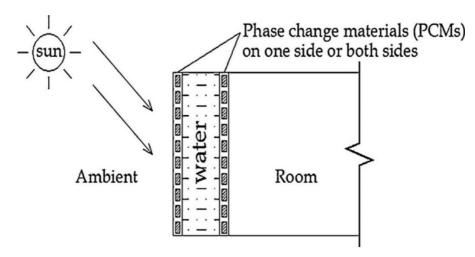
Water Wall System Integrated with Phase Changing Material (Wu & Lei, 2016)
